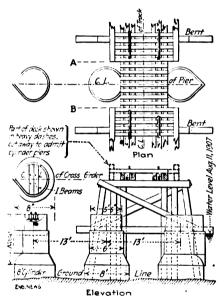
ARRANGEMENT OF CYLINDER PIERS
